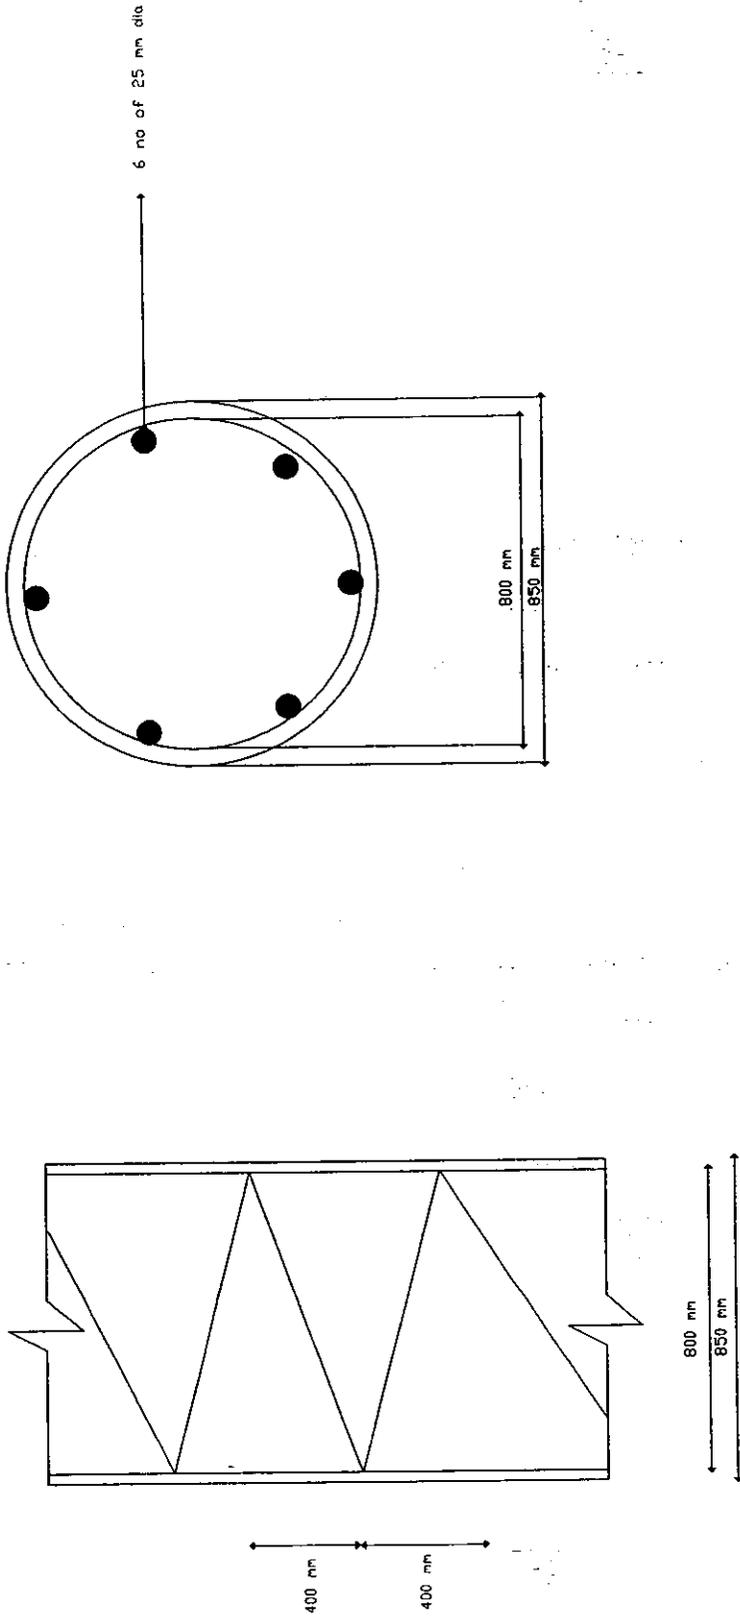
FOOTING REINFORCEMENT OF FLAT SLAB
